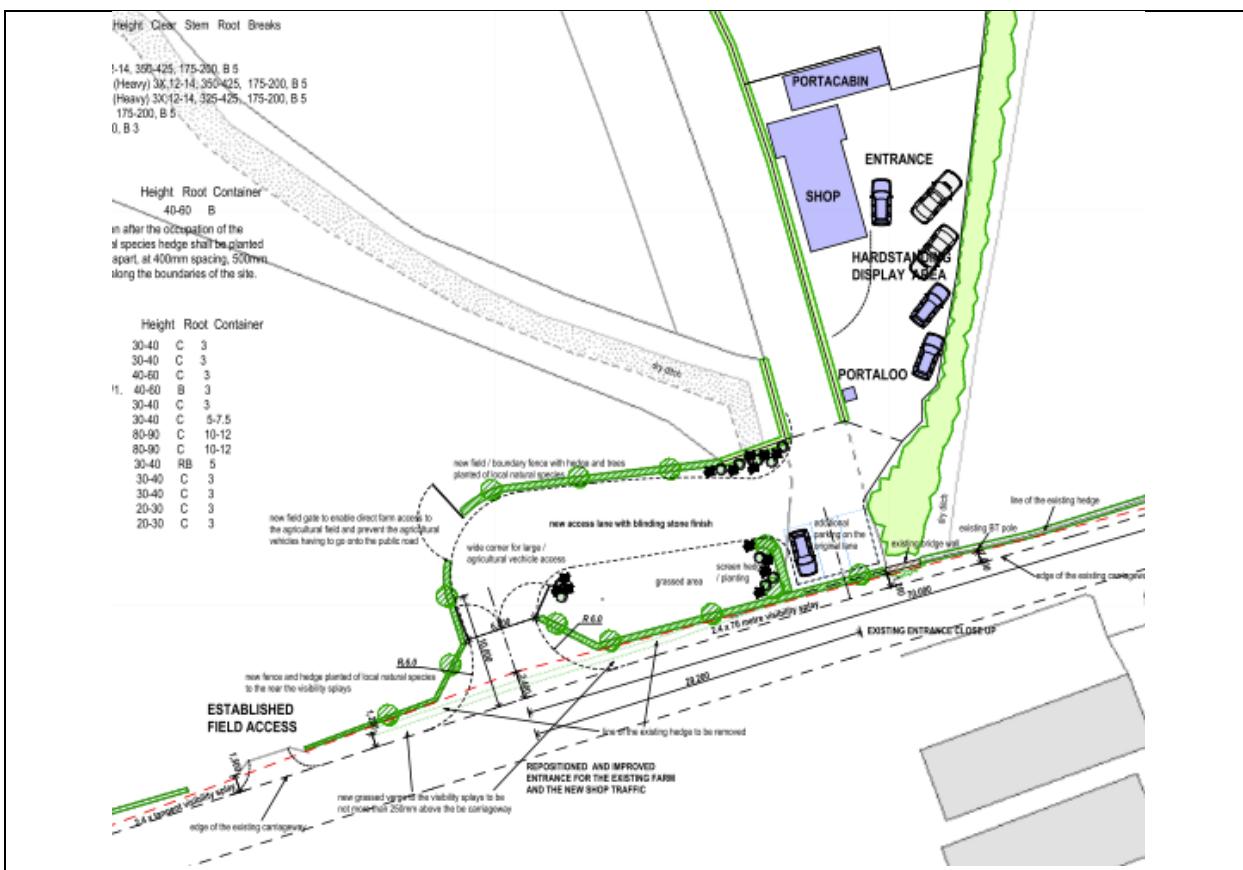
Proposed site layout showing the existing access to be closed up and the proposed access to serve both the farm and farm shop traffic.
